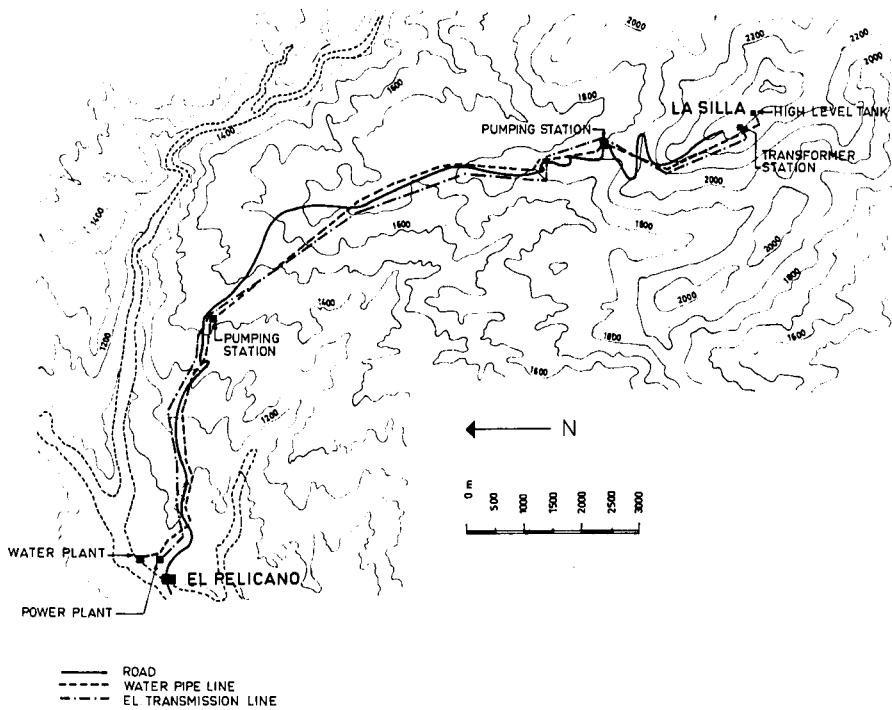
General lay-out of water pipe line, electric transmission line and road from Campamento Pelícano to Cerro La Silla.
